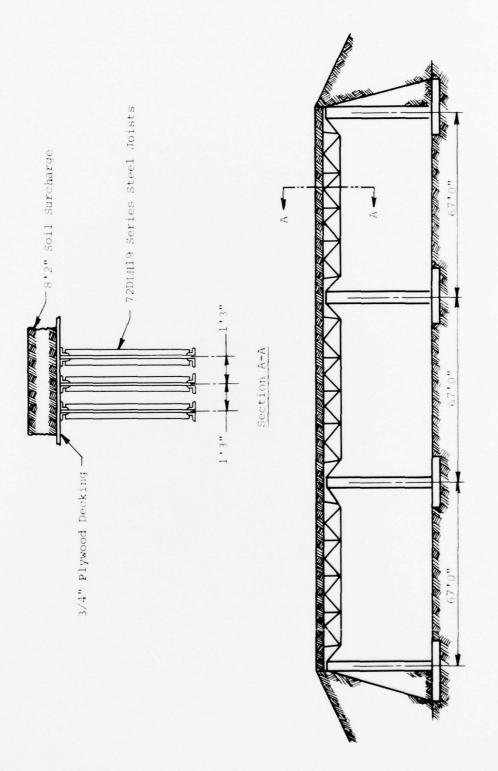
Long-Span Joists - 200-Foot Span 1000 psf Surcharge
